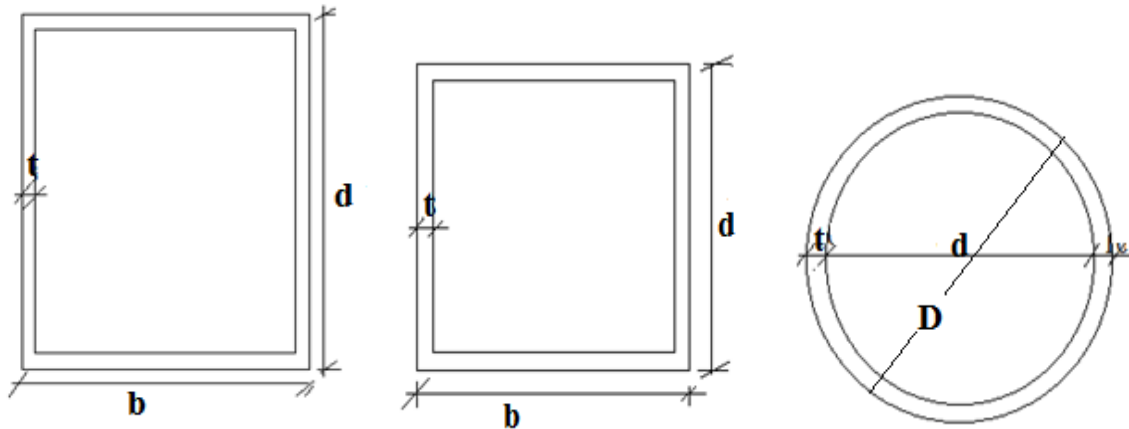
Cross-section taken for the analysis without longitudinal reinforcement.
